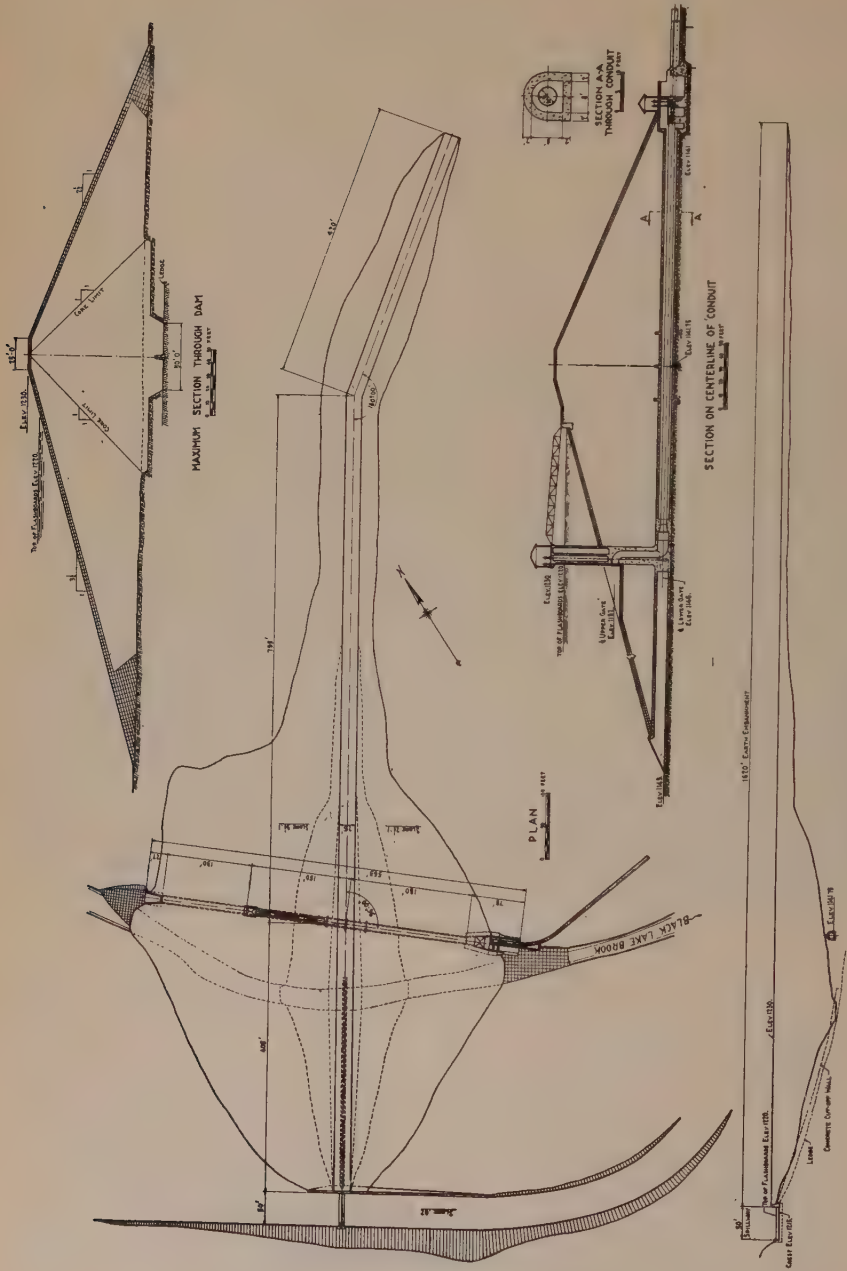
PLAN AND SECTION OF TORONTO RESERVOIR DAM
